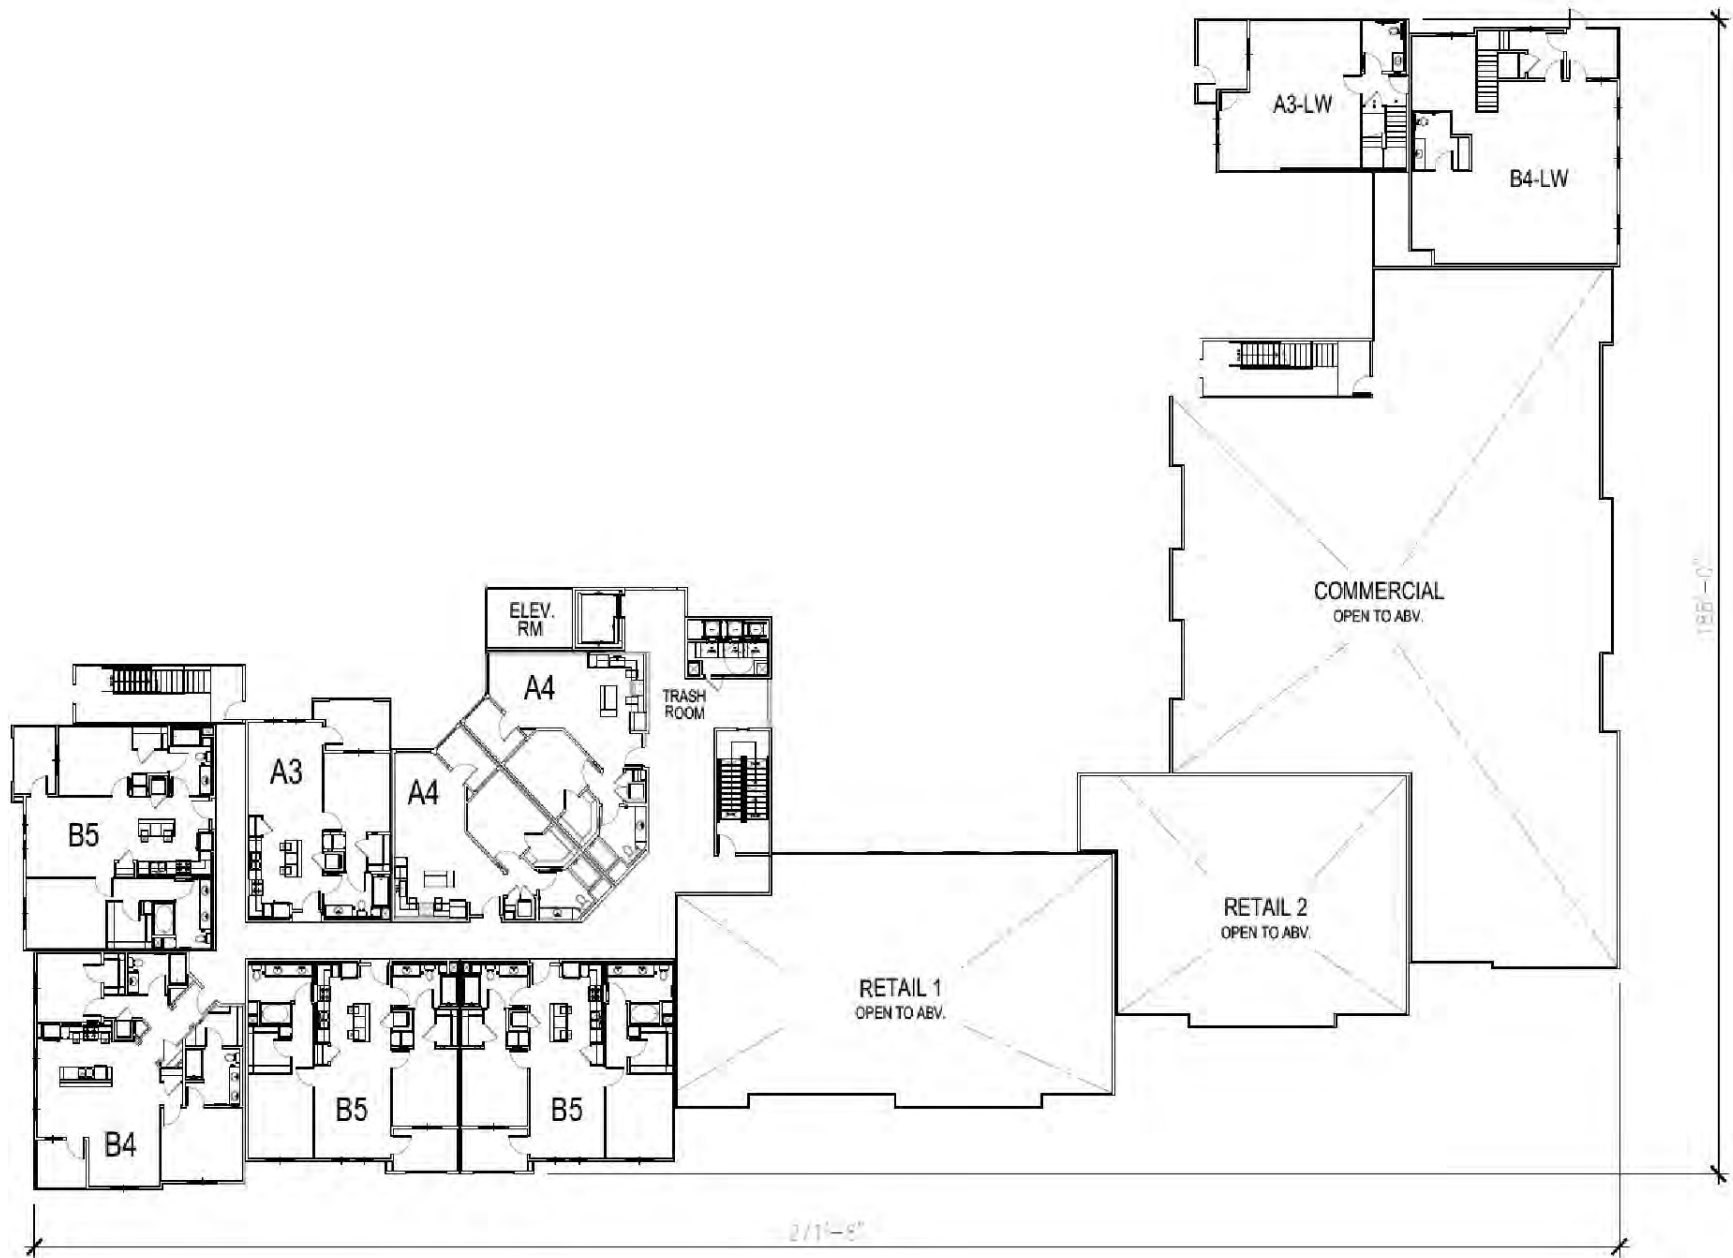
Type G Building 10 - 1st Floor Plan
